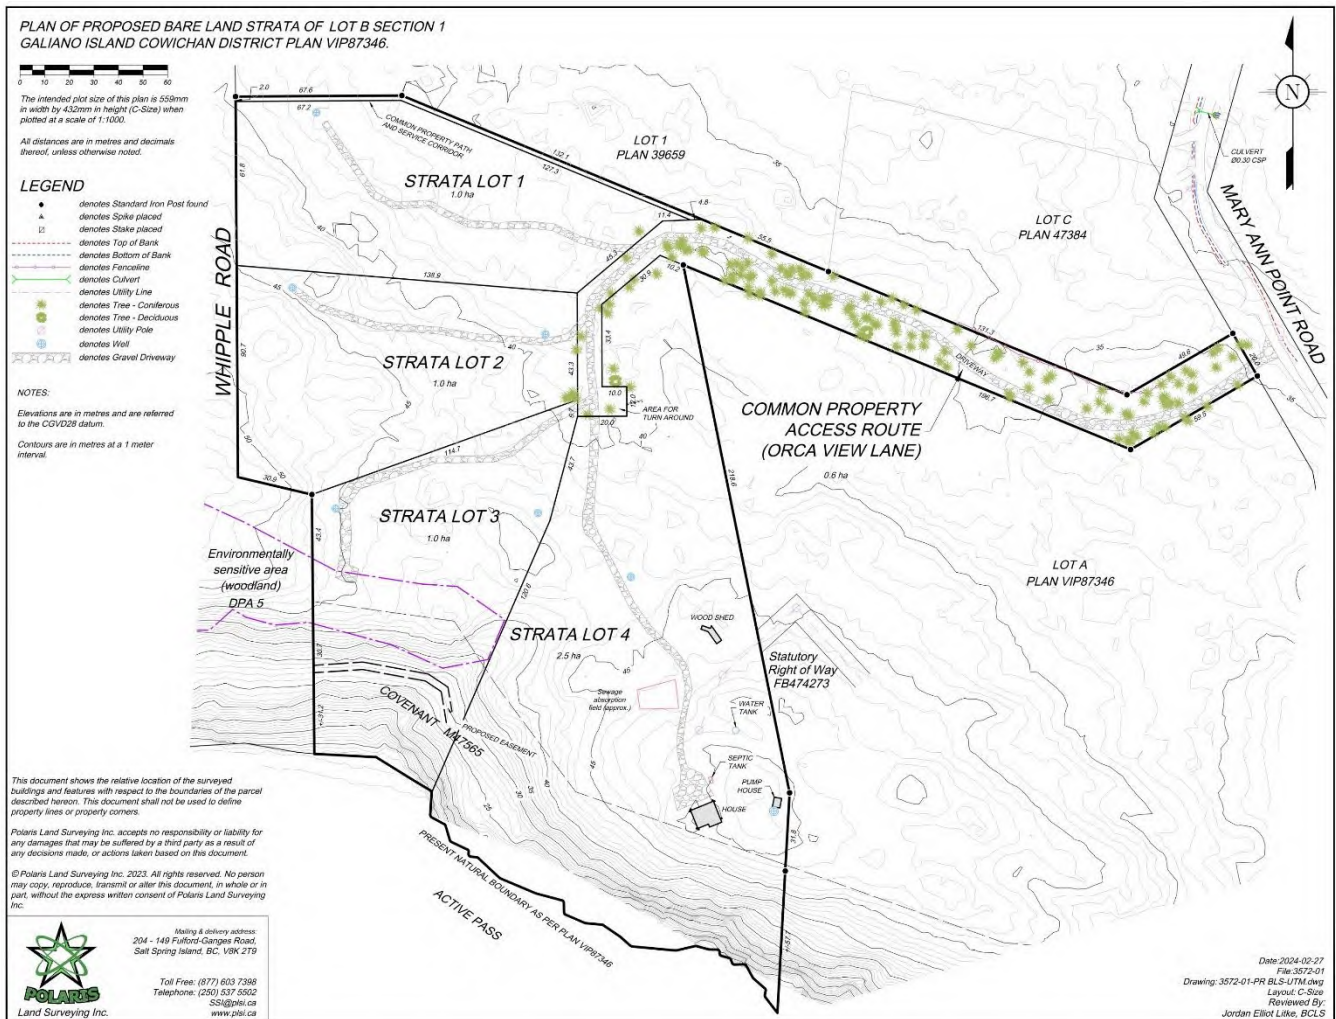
FIGURE TWO – PROPOSED SUBDIVISION LAYOUT PLAN
